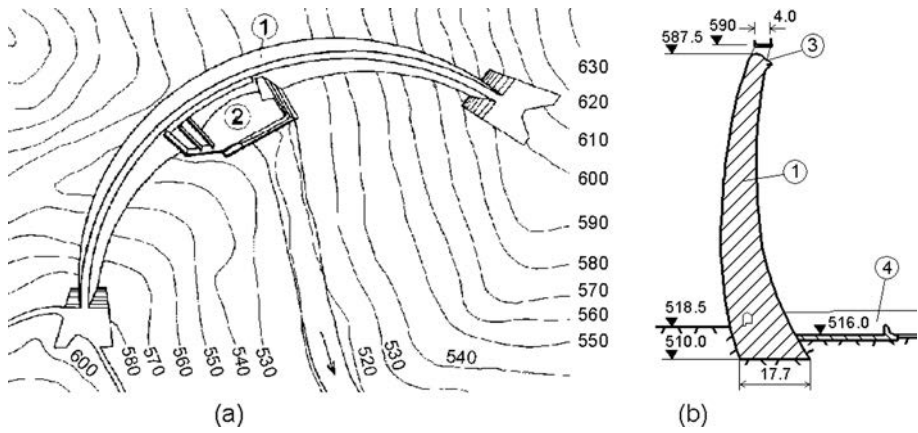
Glazhnja dam. (a) Plan; (b) cross-section; (1) dam's body; (2) overflow section with stilling basin; (3) overflowing crest; (4) stilling basin.
